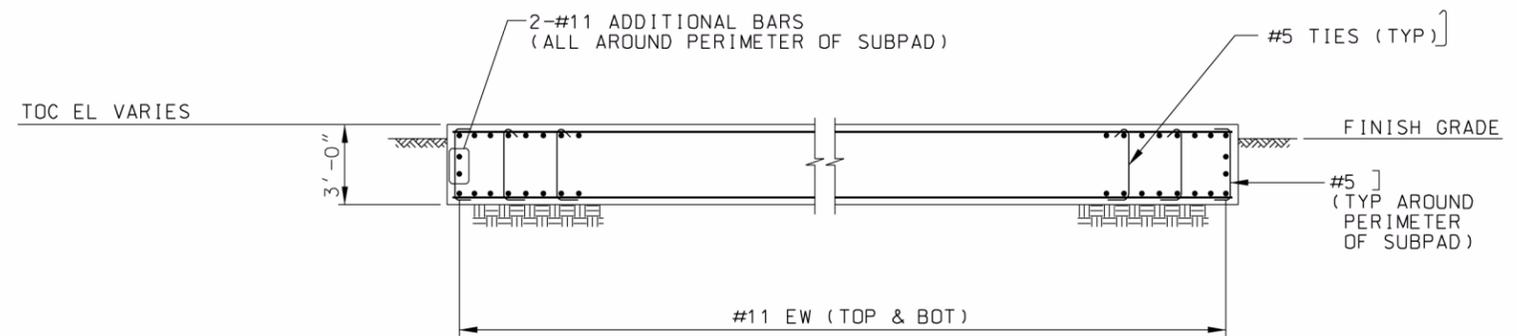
Typical Receipt Facility Reinforcing Sections
